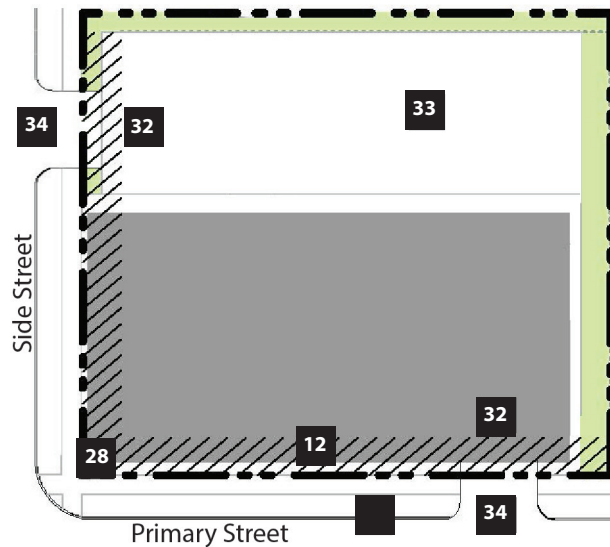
Limited bay building siting diagram shown with rear vehicular access and the vehicle bay on the primary street. Not to scale.
